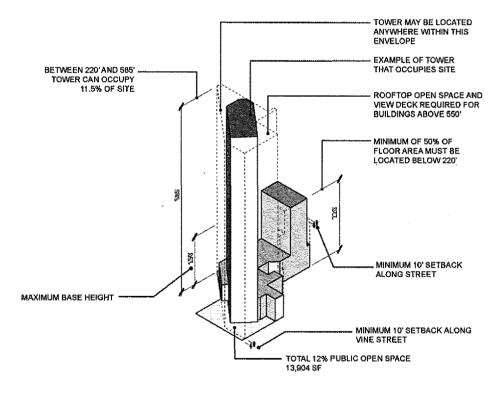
d.1: East Site - 585 Feet Maximum Tower Height
